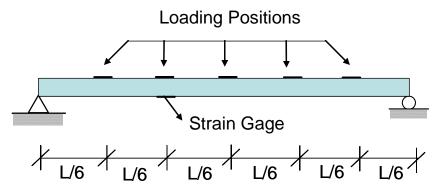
Test Setup and Loading Positions for Simply-Supported Beam
